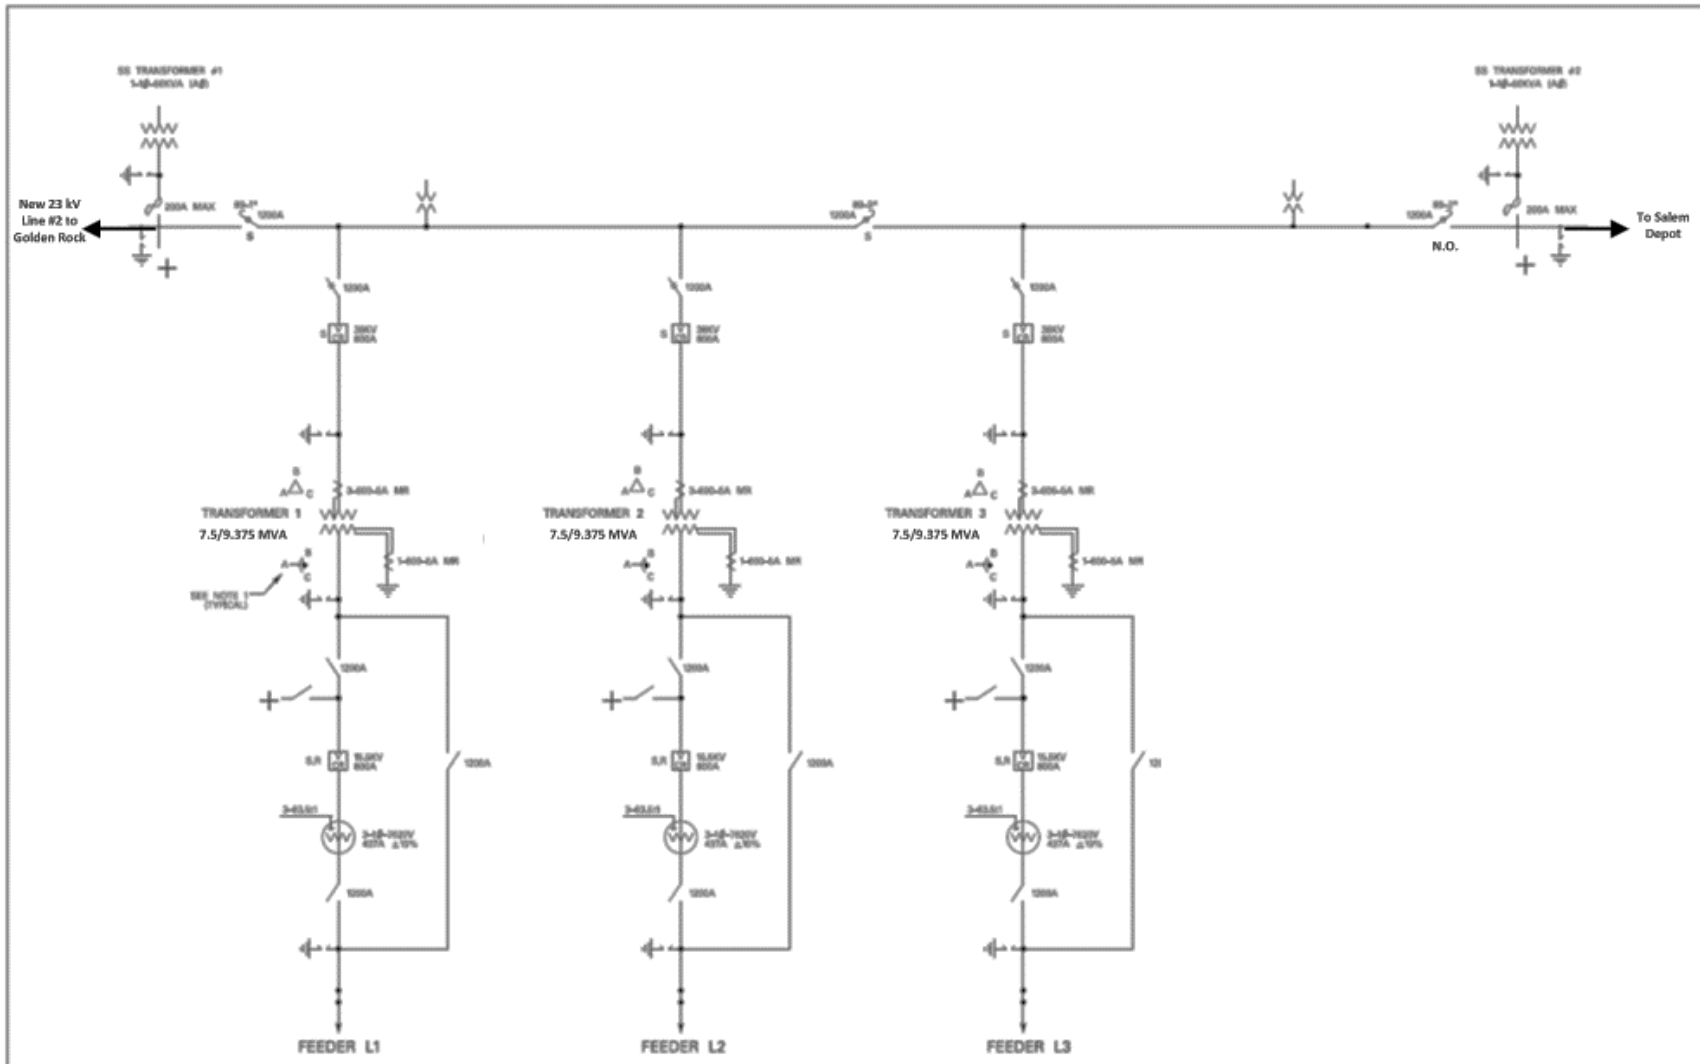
Alternative #5 New 22.8 kV/13.2kV Tuscan Village Substation One Line
